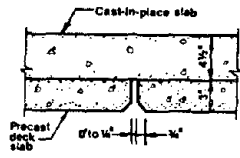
Joint details for concrete deck panels—Pennsylvania State University tests.
